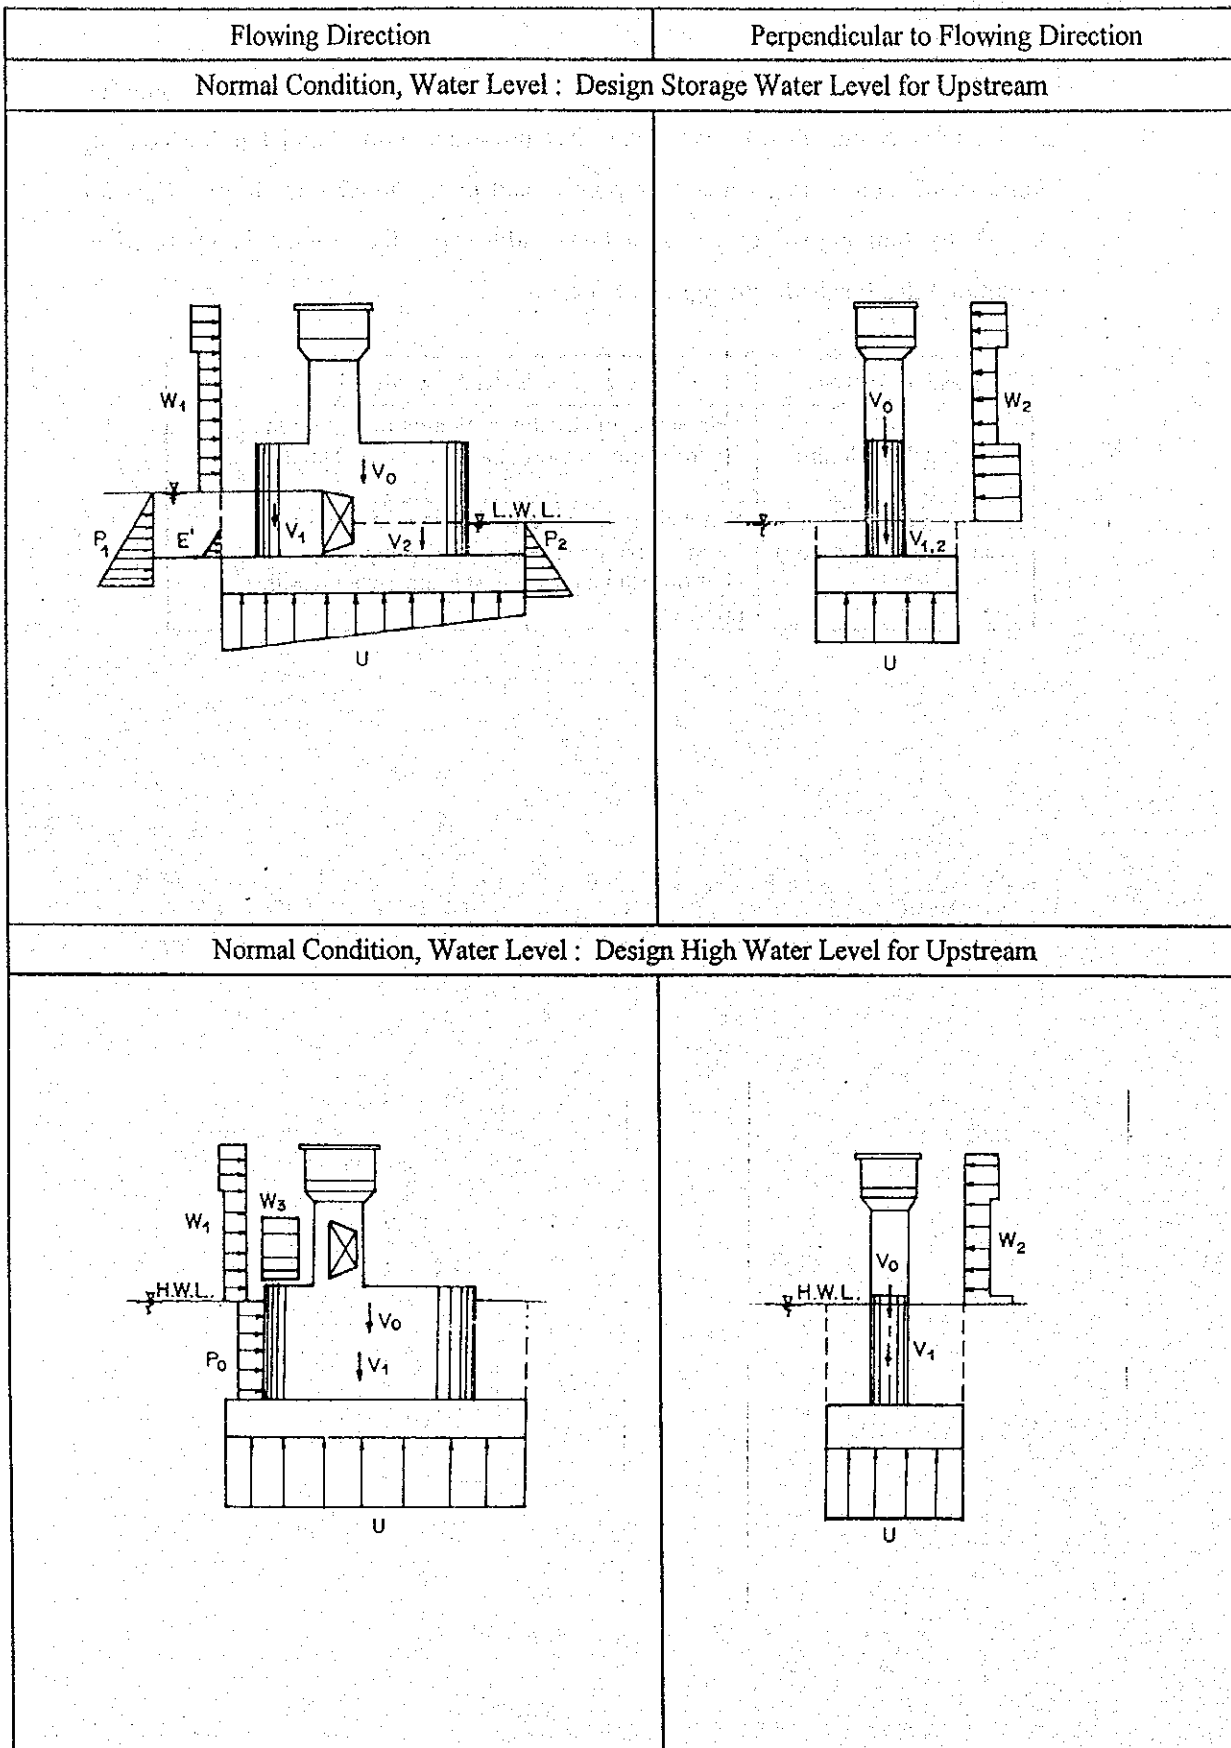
(1/2) Loading Conditions for Center Piers of Weir
